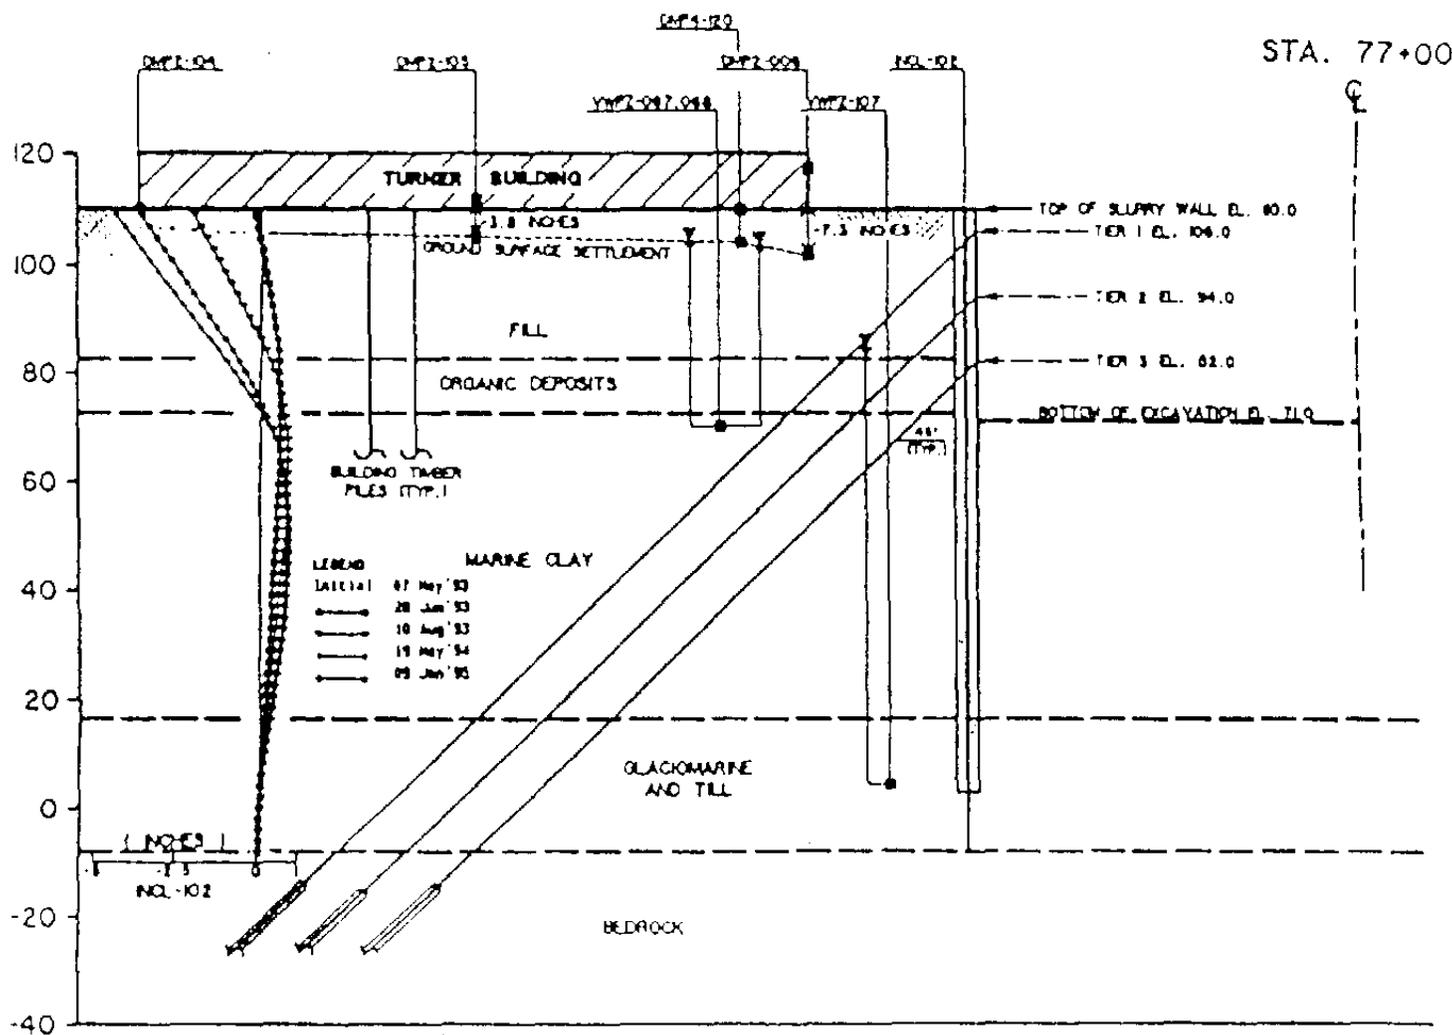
Deformations at Station 77+00, Slurry Wall (Vaghar and Bobrow)
